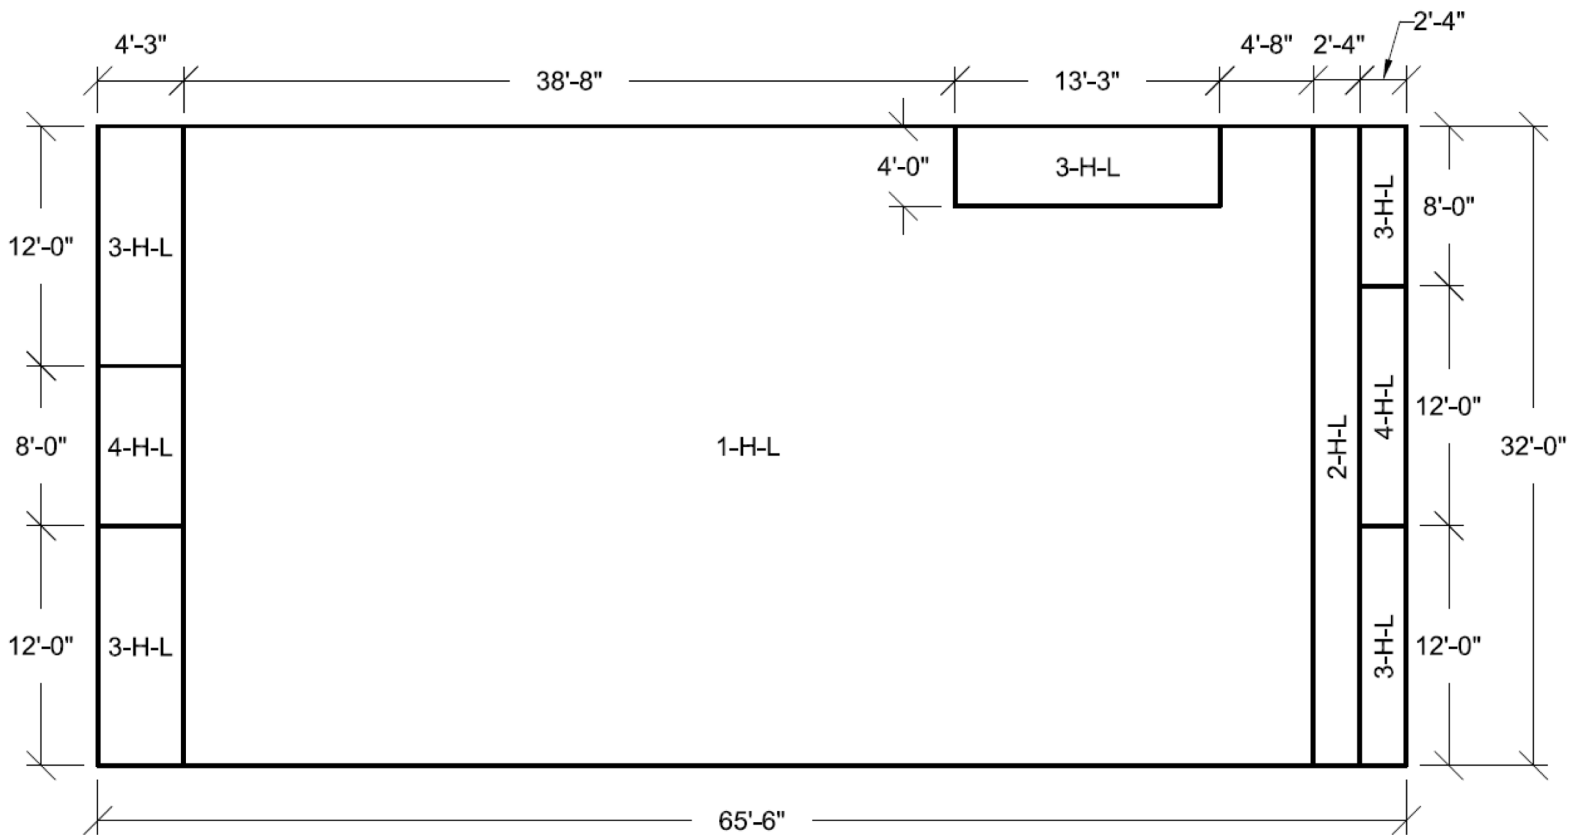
H.6-163 DGFOSV Wall 7 Looking From Outside Horizontal Reinforcement Zones Near Side Face
